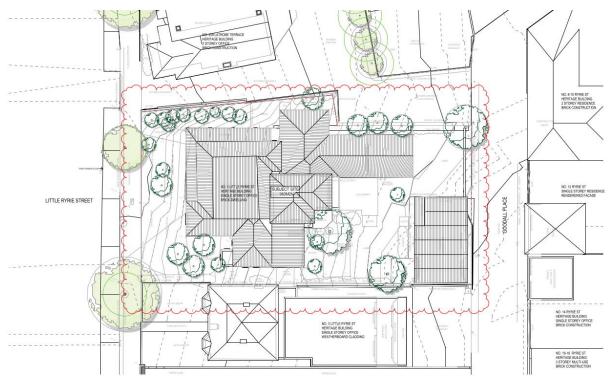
Existing conditions plan (Source: Cera Stribley Architects)
